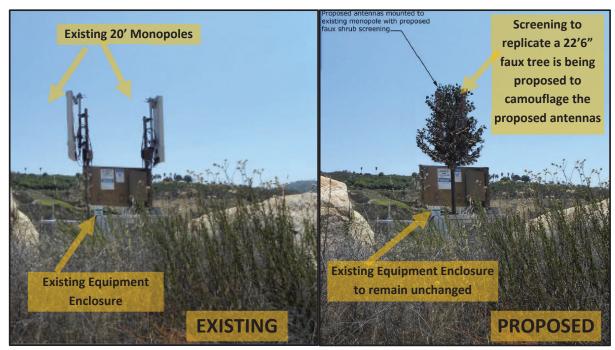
View on site of existing monopole (left) and proposed (right) faux tree and equipment enclosure, looking northwest.
